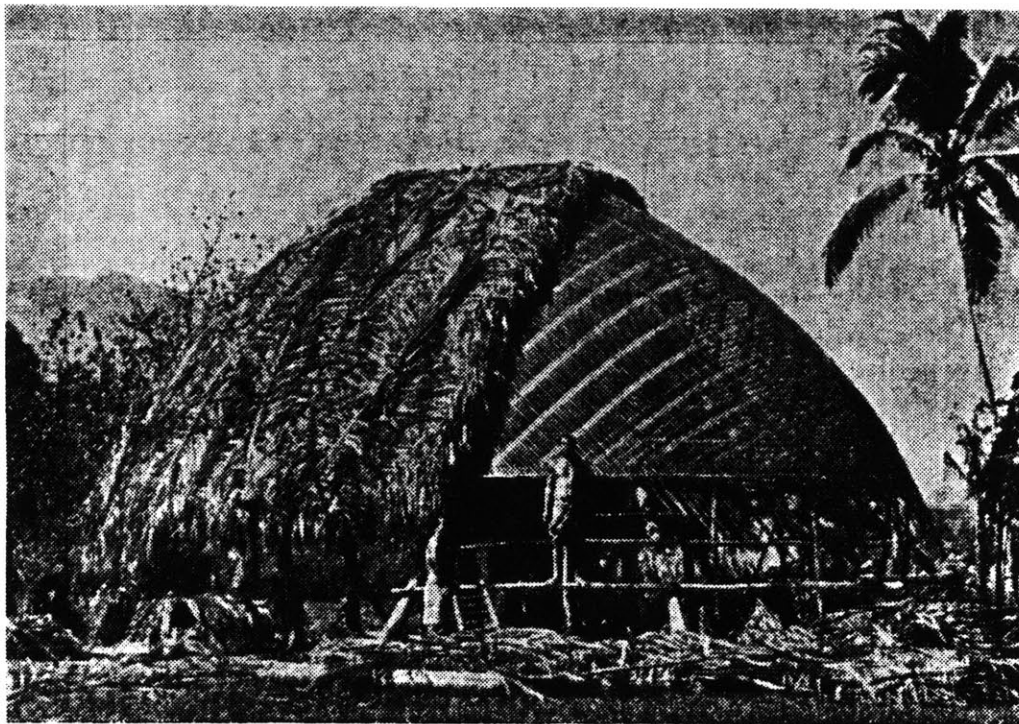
Chief's house: an institutional building with thatch roof in Samoa.
